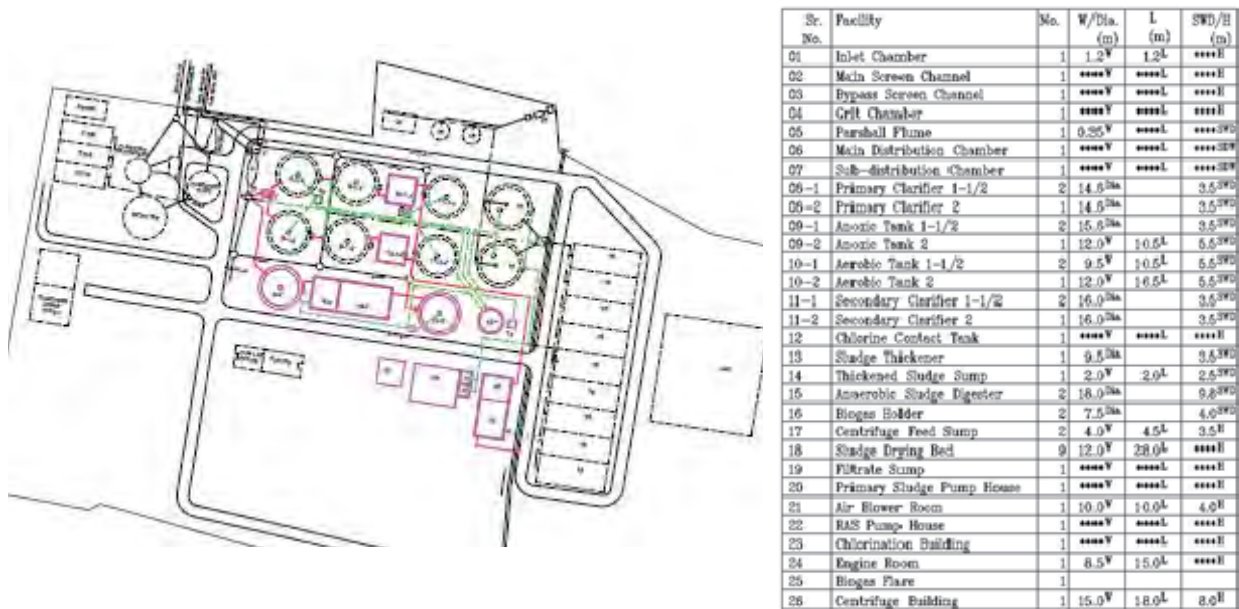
Layout plan of Bhagwanpur STP (Single-stage CND plan, Alternative)
